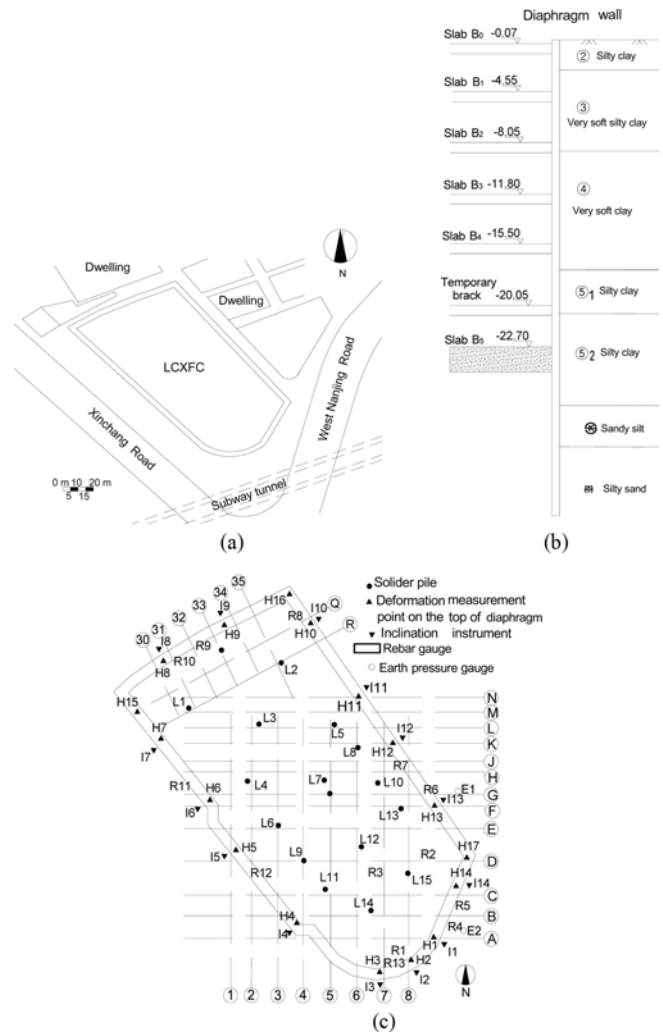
Site Plan, Section Through the Bracing System, and Layout of the Instruments: (a) Site Plan of the LCXFC Building, (b) Section Through the Bracing System of the Diaphragm Wall, (c) Layout of the Instruments
